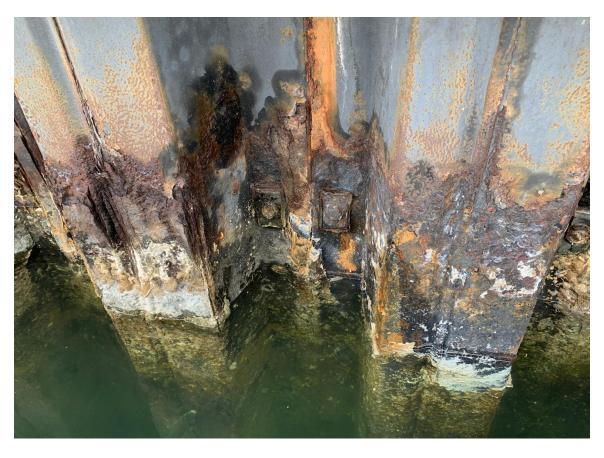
Severe corrosion in west wall (Port Royal Side)
